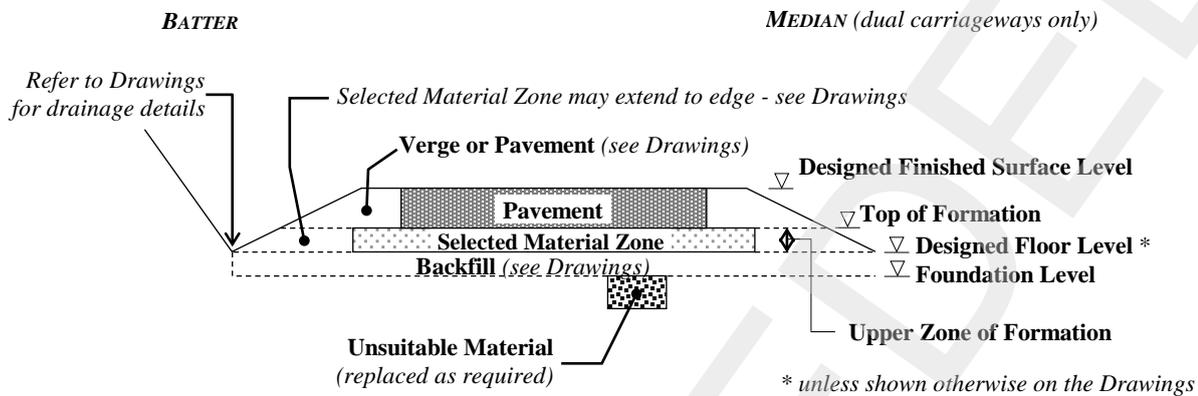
(b) – Cutting Floor Treatment Type C2 – Excavation and Backfill
